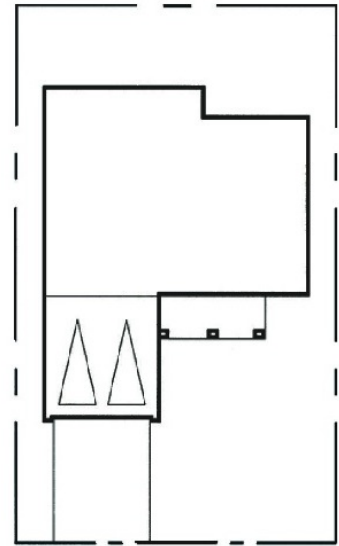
Garage/Floor Plan Configurations (Continued)Medium-Recessed Garage:
